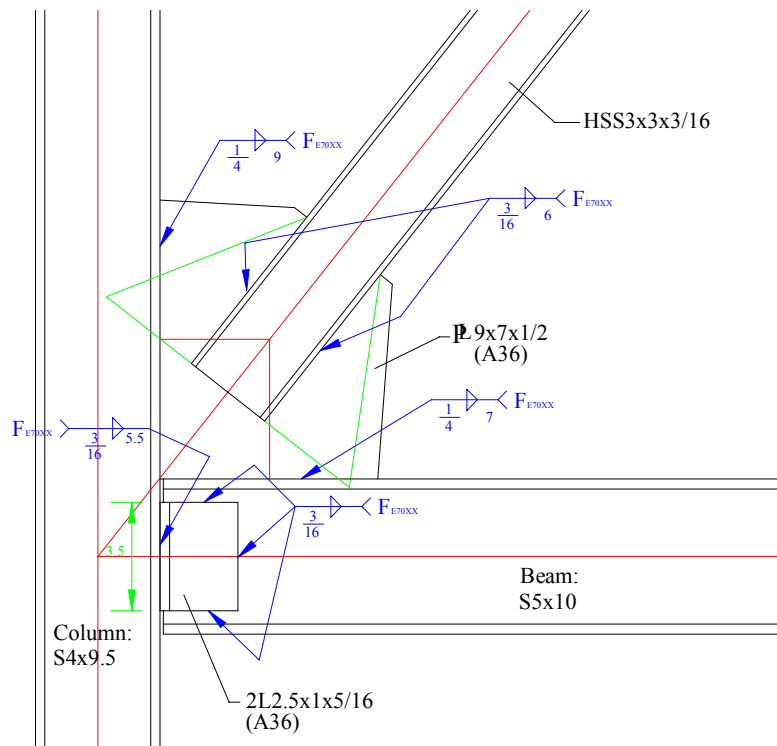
Details of the 3rd-floor brace-beam-column connection.
